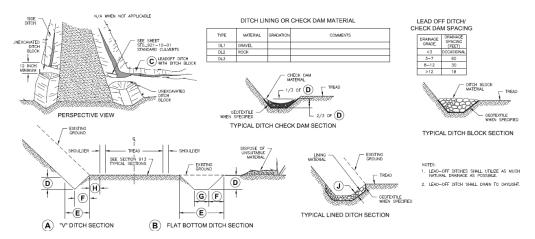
Typical ditch sections STD 925-01 (U.S DEPARTMENT OF AGRICULTURE, FOREST SERVICE)
